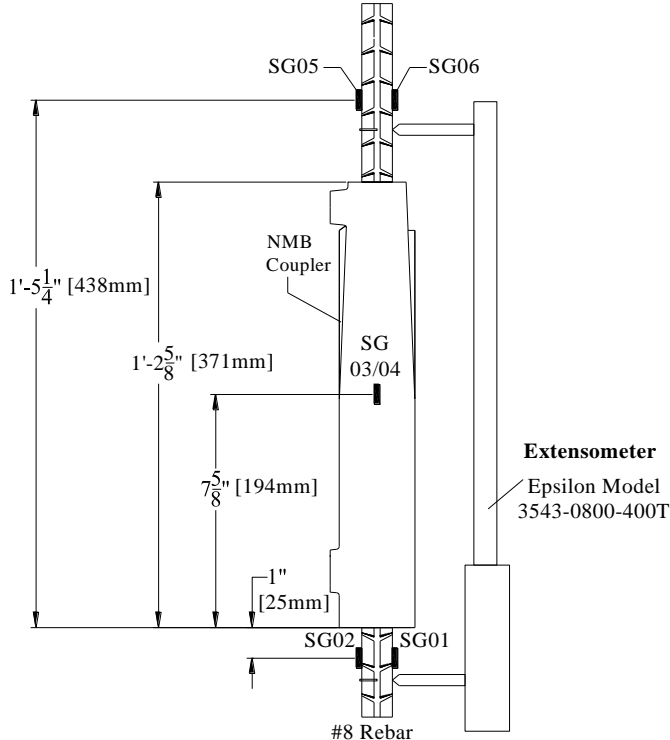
Instrumentation plan for GC couplers (Static and High Rate Tests)
